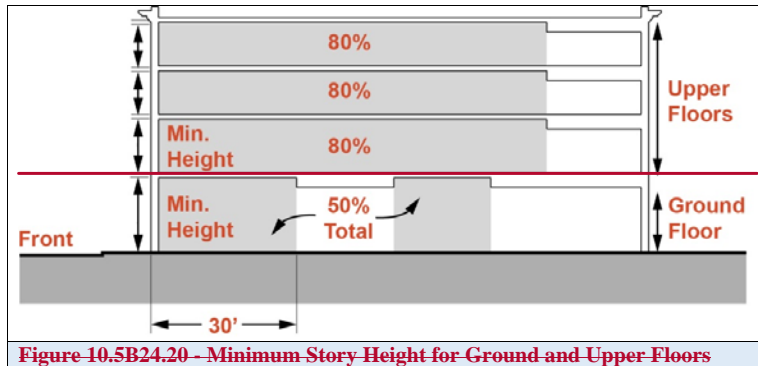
B24.20 - Minimum Story Height for Ground and Upper Floors
